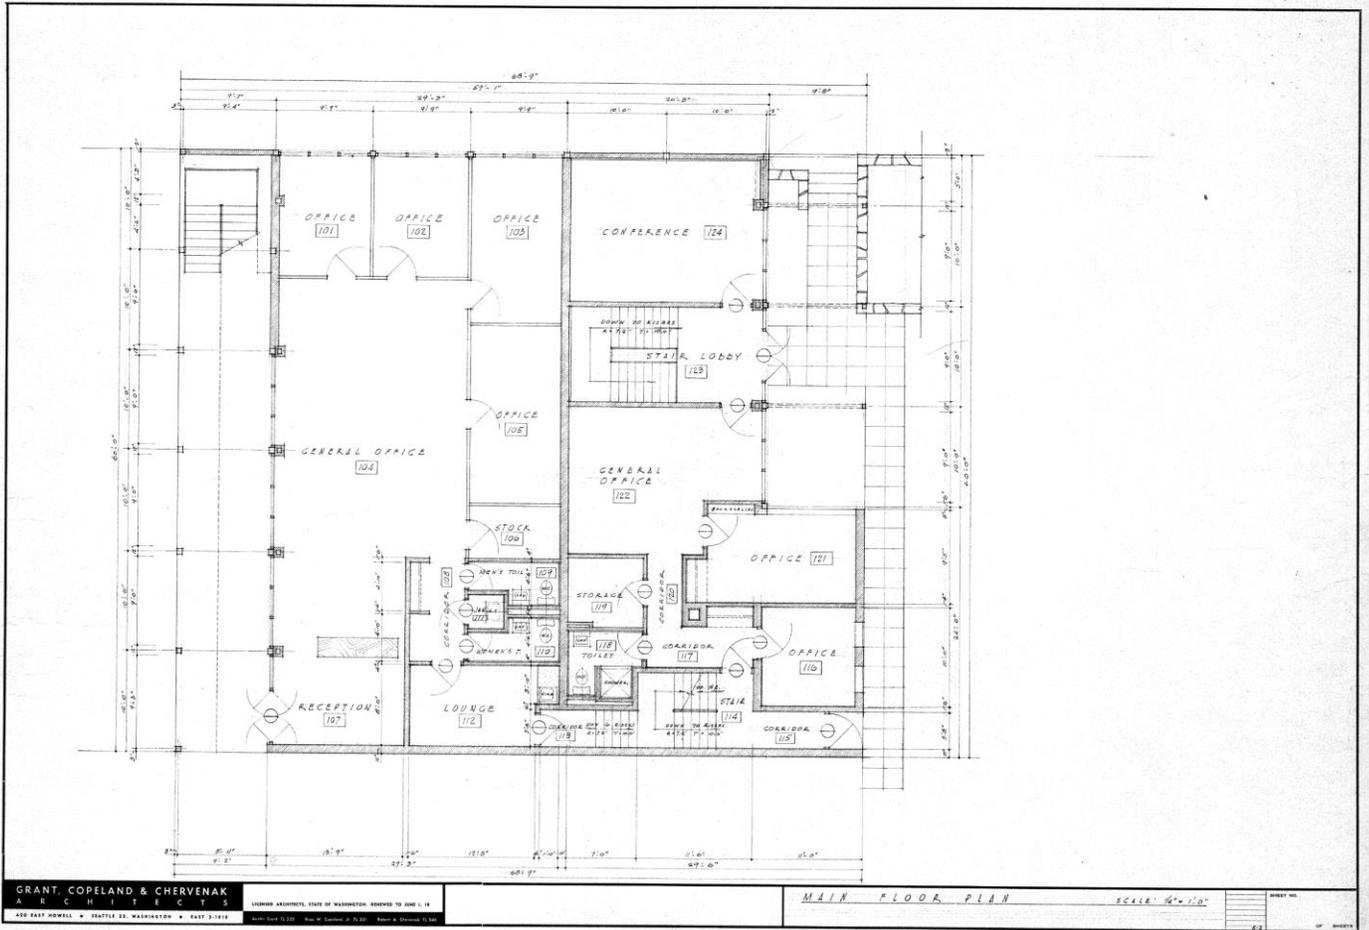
FIRST FLOOR PLAN (GRANT, COPELAND AND CHERVENAK, 1959)
